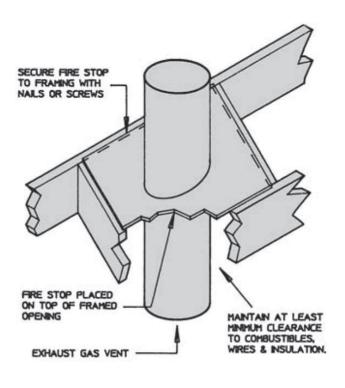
TYPICAL CEILING AND ROOF PENETRATION DETAIL
